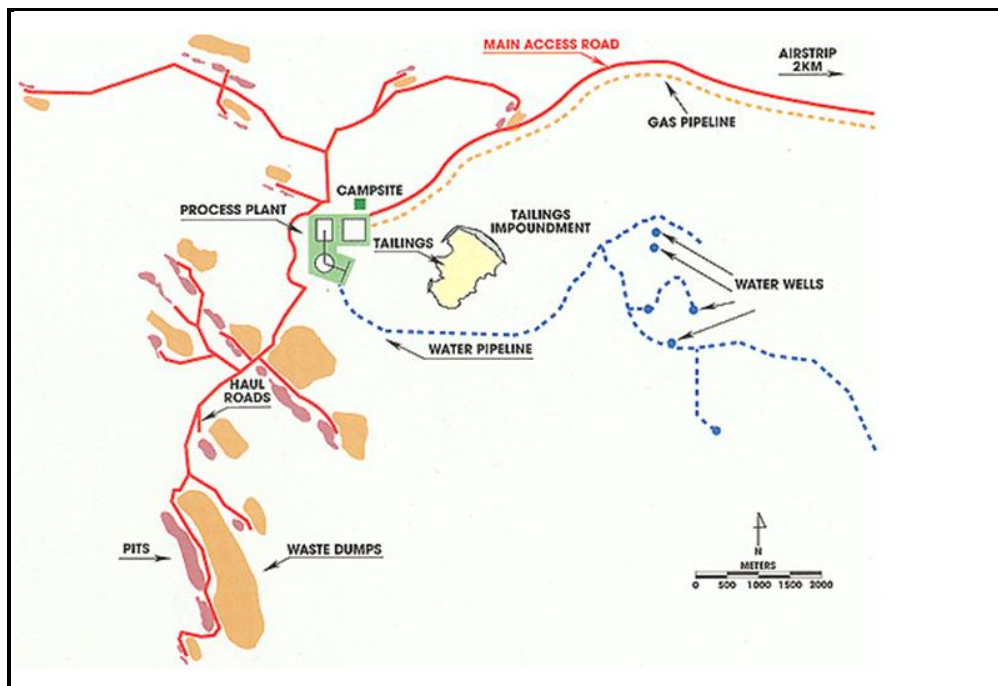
Site plan of CVSA (Courtesy: AGA)
